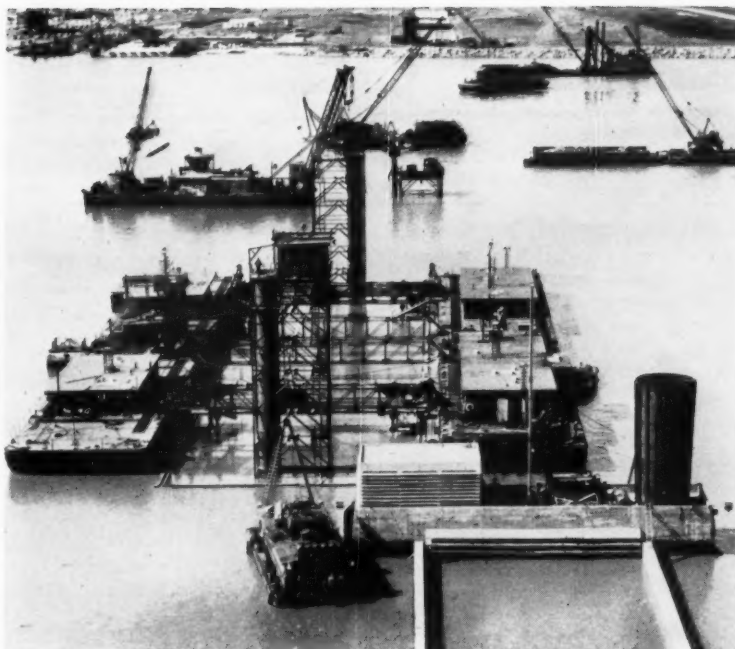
Deas Island Tunnel will open up new area south of Vancouver and provide direct connection to Trans-Canada Highway and U. S. border.
